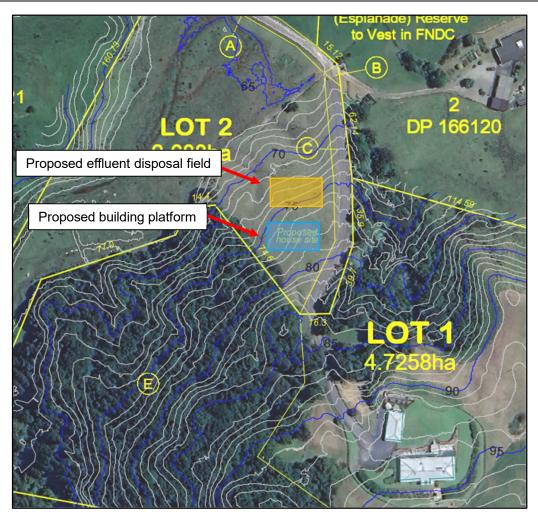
Proposed subdivision plan (Williams and King Ltd).
